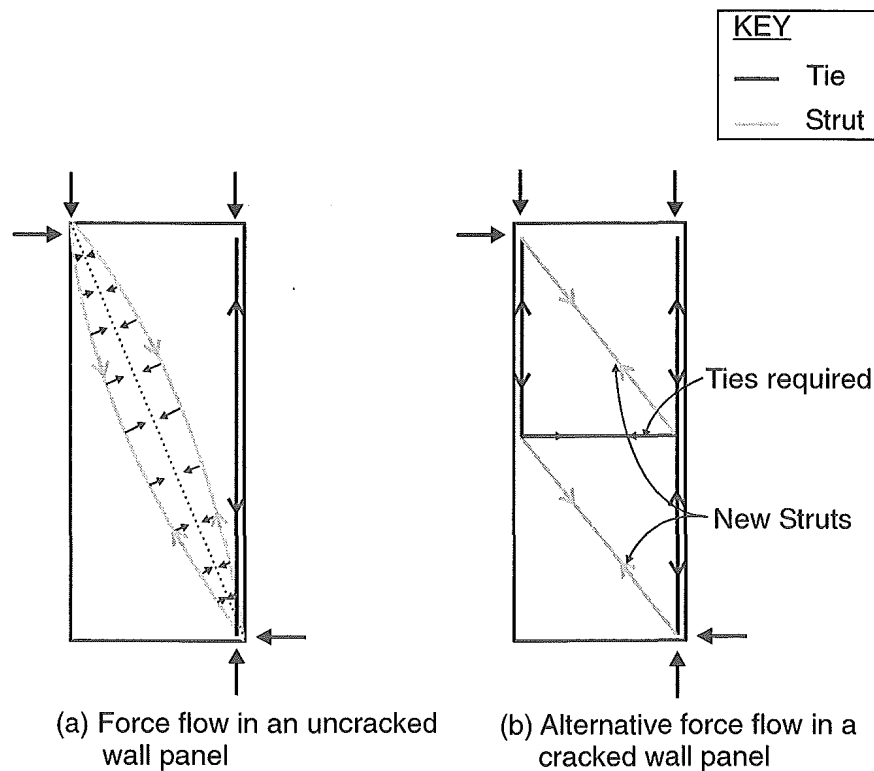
Alternative internal force flow in the wall panel under lateral loading.
